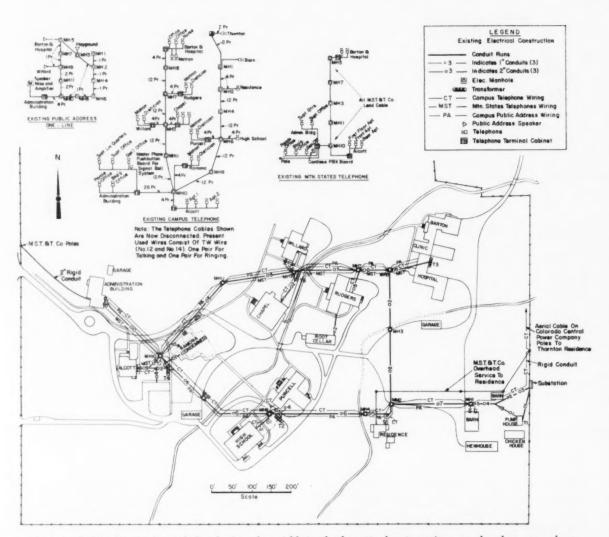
Reduced-scale site and distribution plan. Additional schematic drawings often are placed on same sheet.
